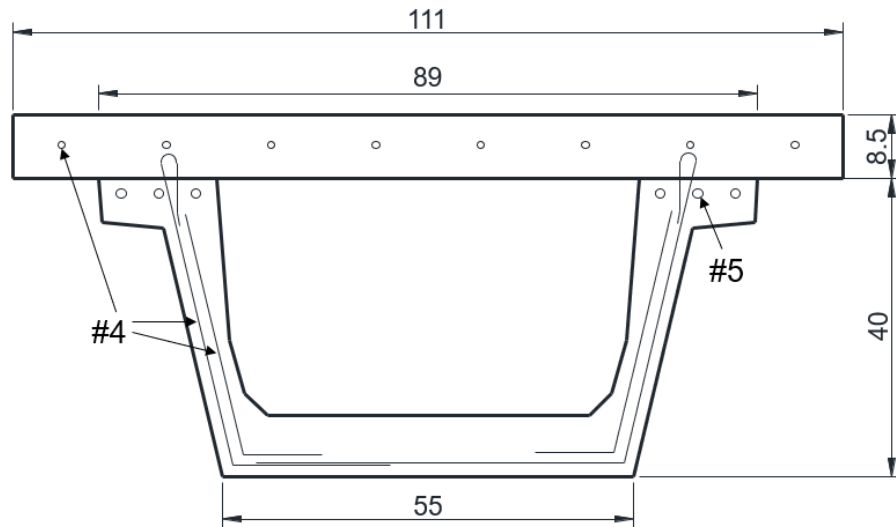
The cross-section geometry and reinforcement detail for U-40 and 8.5-in. height deck
